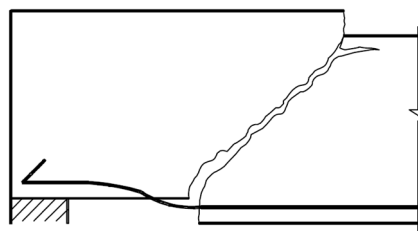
Shear sliding failure of RC beam without shear reinforcement (Al-Emrani et al., 2013).
